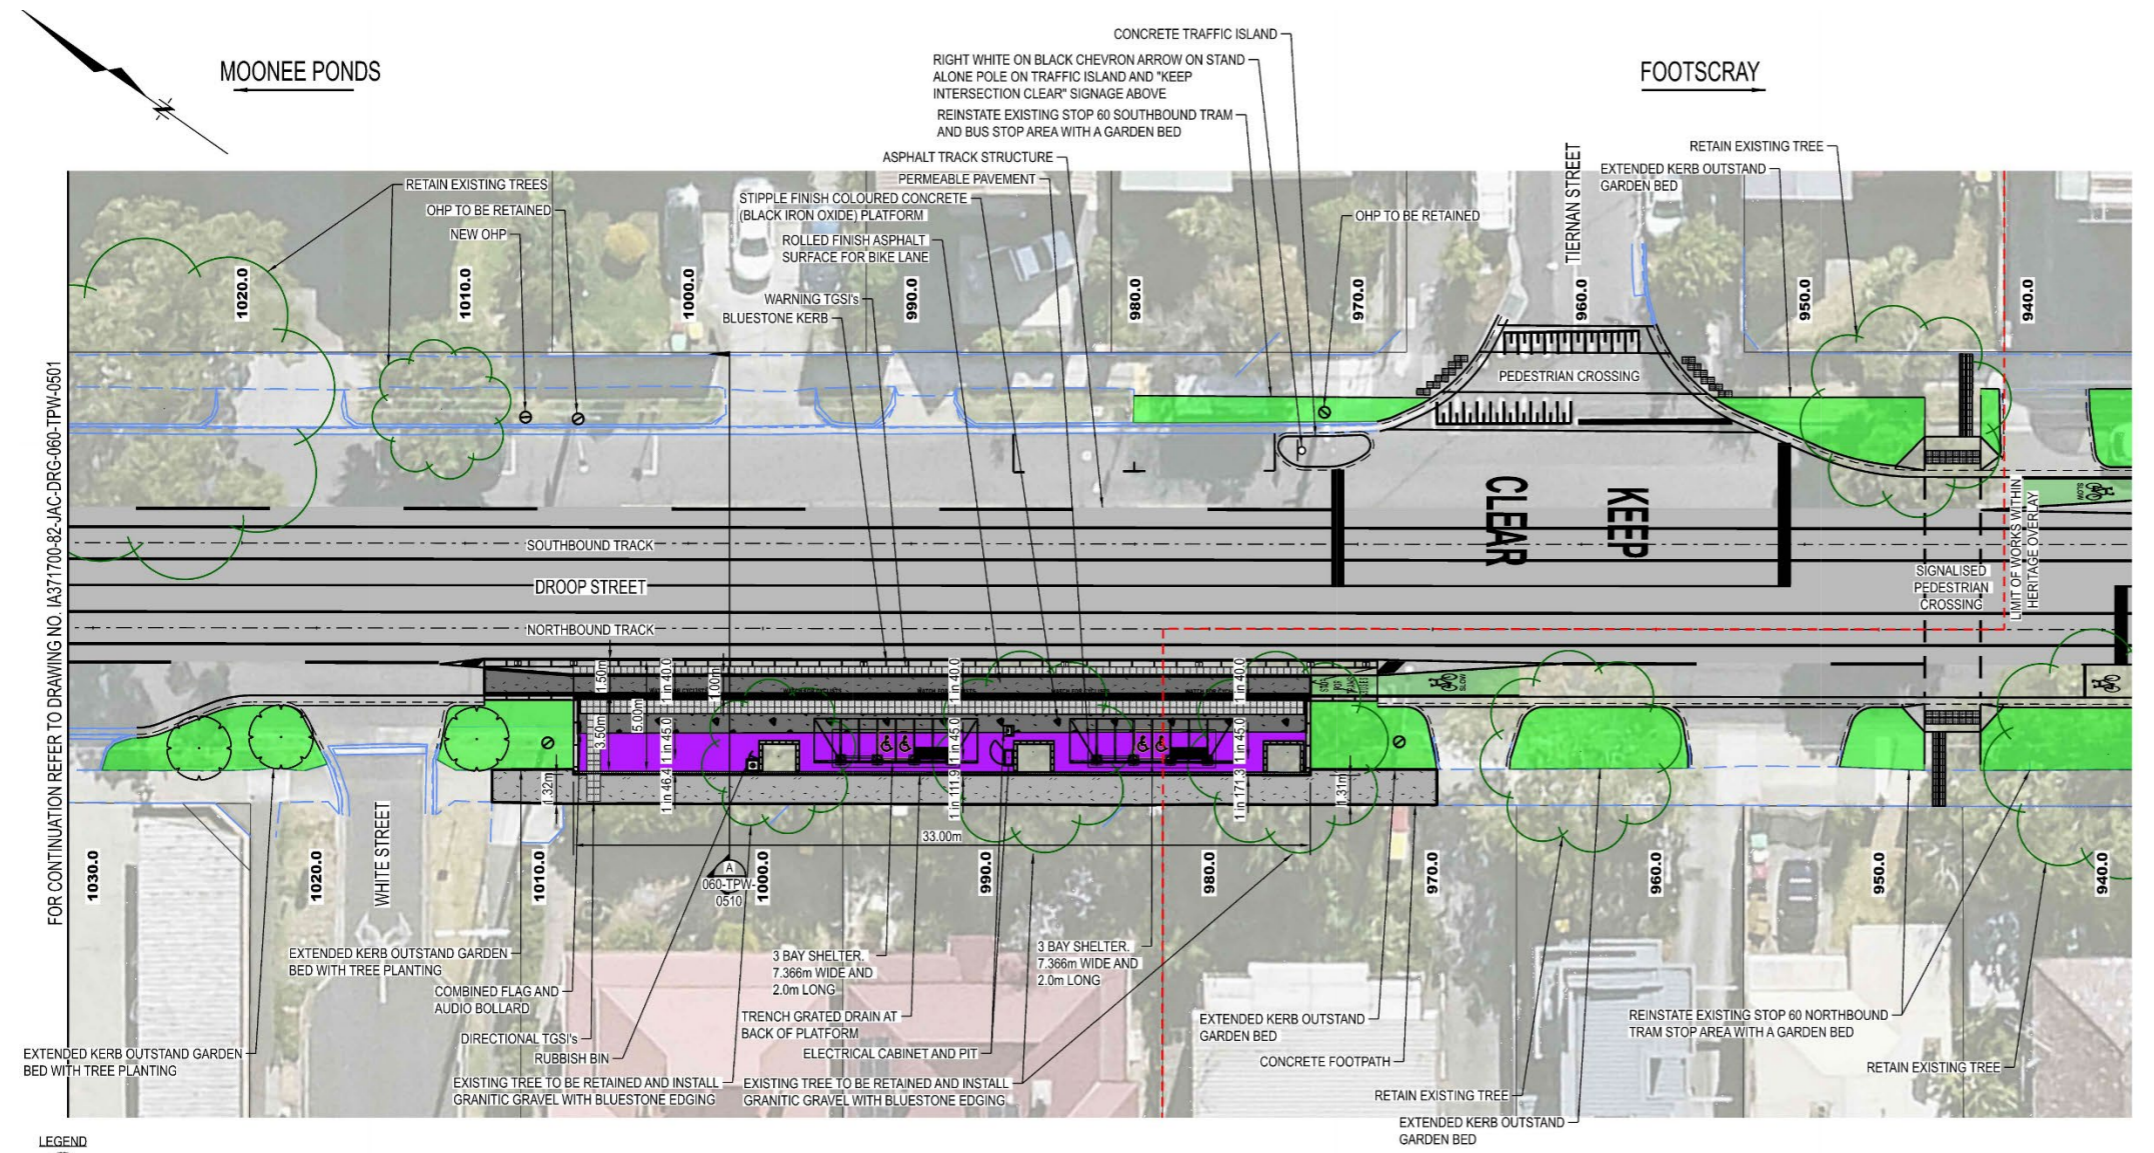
Overview plan and cross sections for the Tiernan Street / Droop Street stop (northbound)
